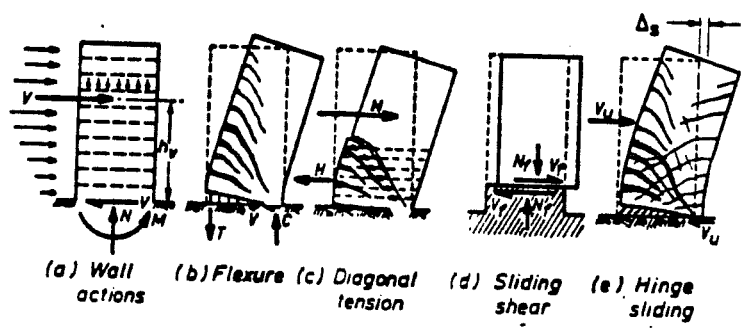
Failure Modes in Cantilevers Walls [3]
